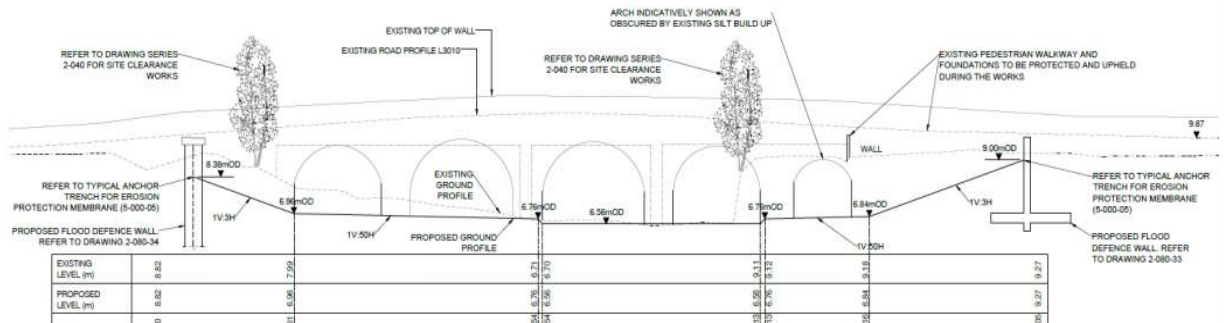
Riverstown Bridge Typical Elevation Indicating Proposed Bridge Arch Clearance Works (looking downstream)
